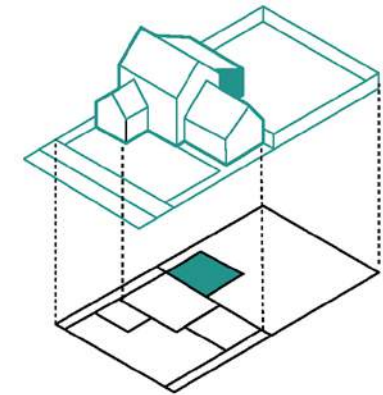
An acceptable example of a rear extension with a roof form and pitch which sits below the main ridge line of the original building.
